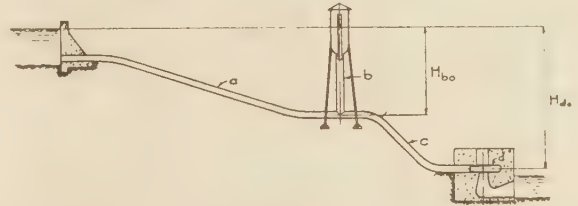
TYPICAL SURGE-TANK INSTALLATION
